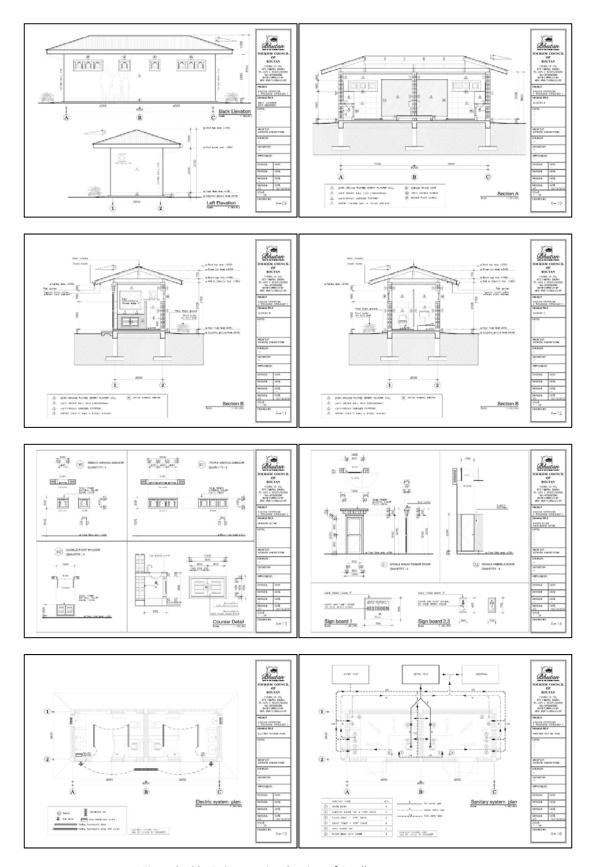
Construction drawings of Handloom center restrooms
